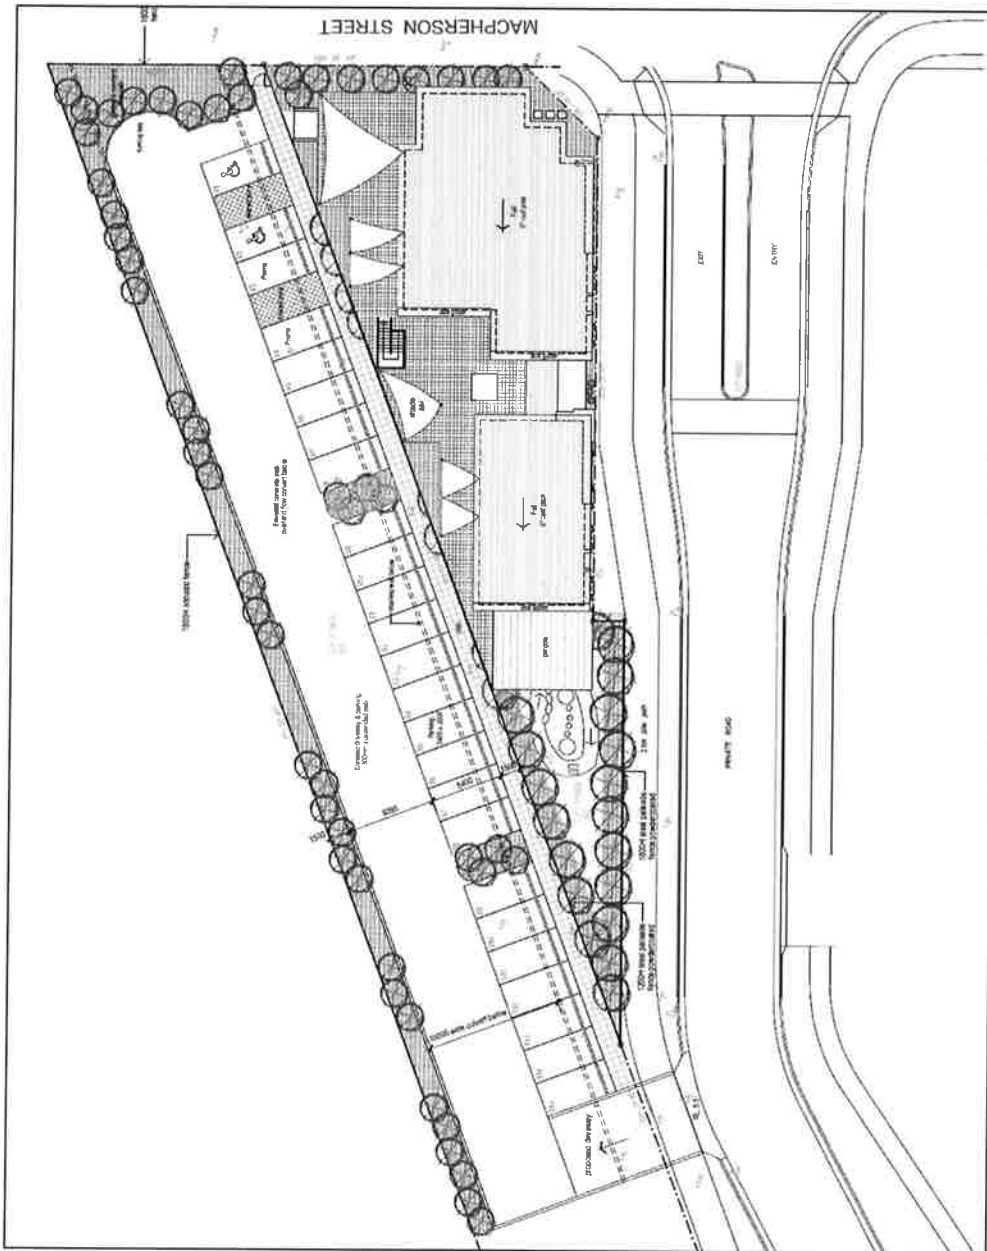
Proposed childcare centre and associated parking area (Source: Proponent's additional information)
